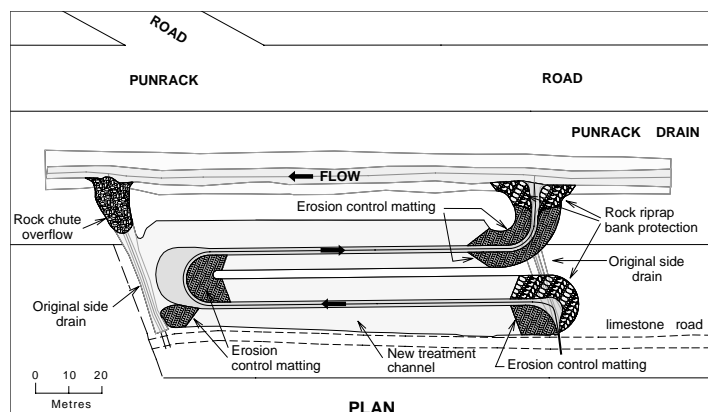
Design to treat side drains prior to entering the main Punrack Drain, site B.
